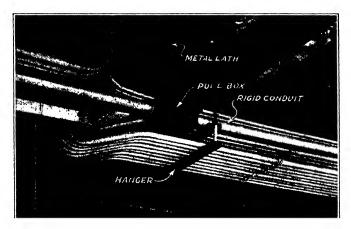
Installation of Thin-Wall Tubing and Rigid Conduit Courtesy of Steel and Tubes, Inc., Cleveland, Ohio
